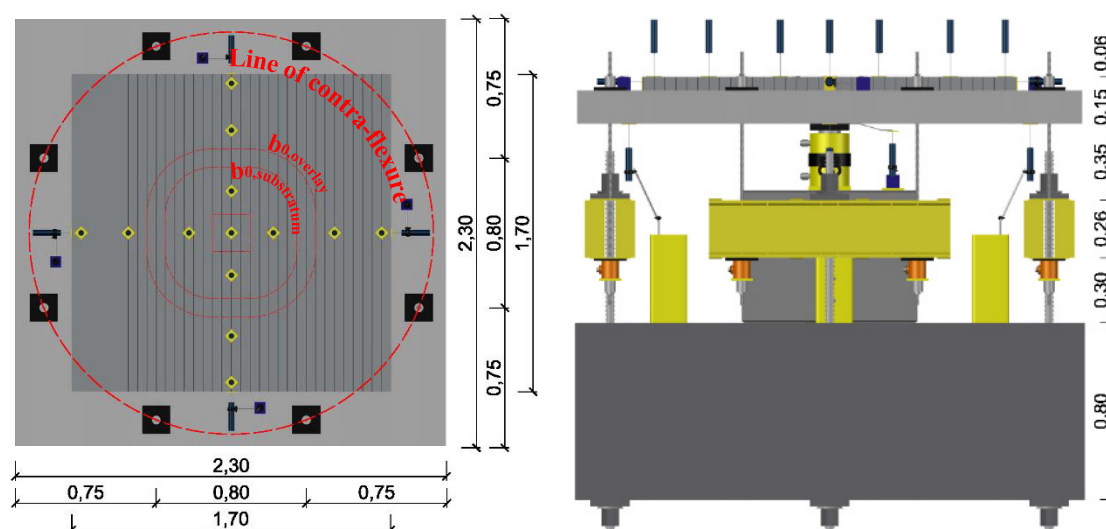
Test layout dimensions, top view (left) and side view (right) – S<sub>4D</sub> specimens.
